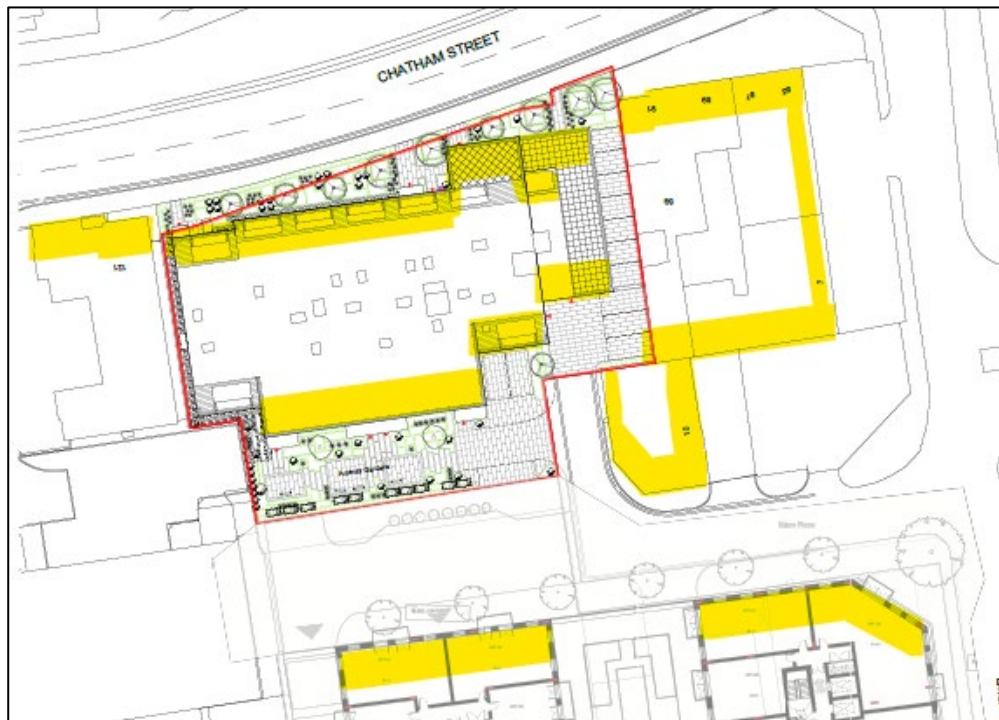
Proposed frontages in relation to Chatham Street (north) and Eaton Place (south). Proposed 112 Oxford Road shown to the south.
